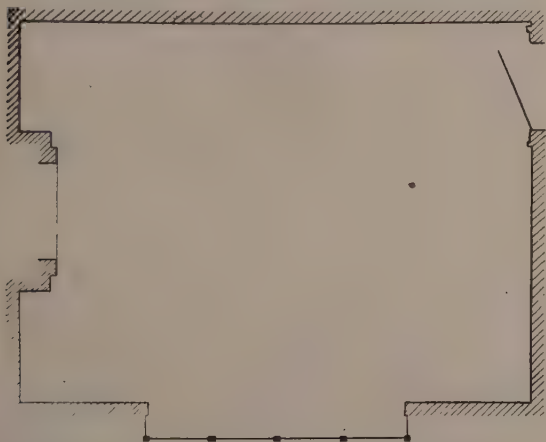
OUTLINE PLAN OF LIVING ROOM.
